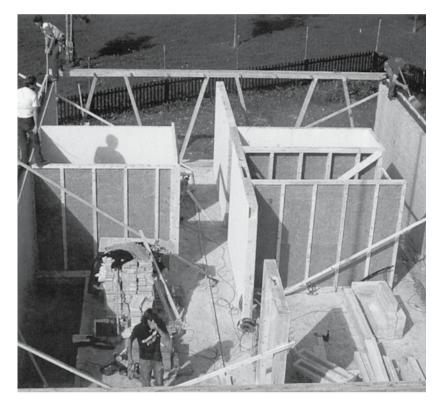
Timber platform frame building during construction Bearth & Deplazes: private house (Hirsbrunner), Scharans (CH), 1995
